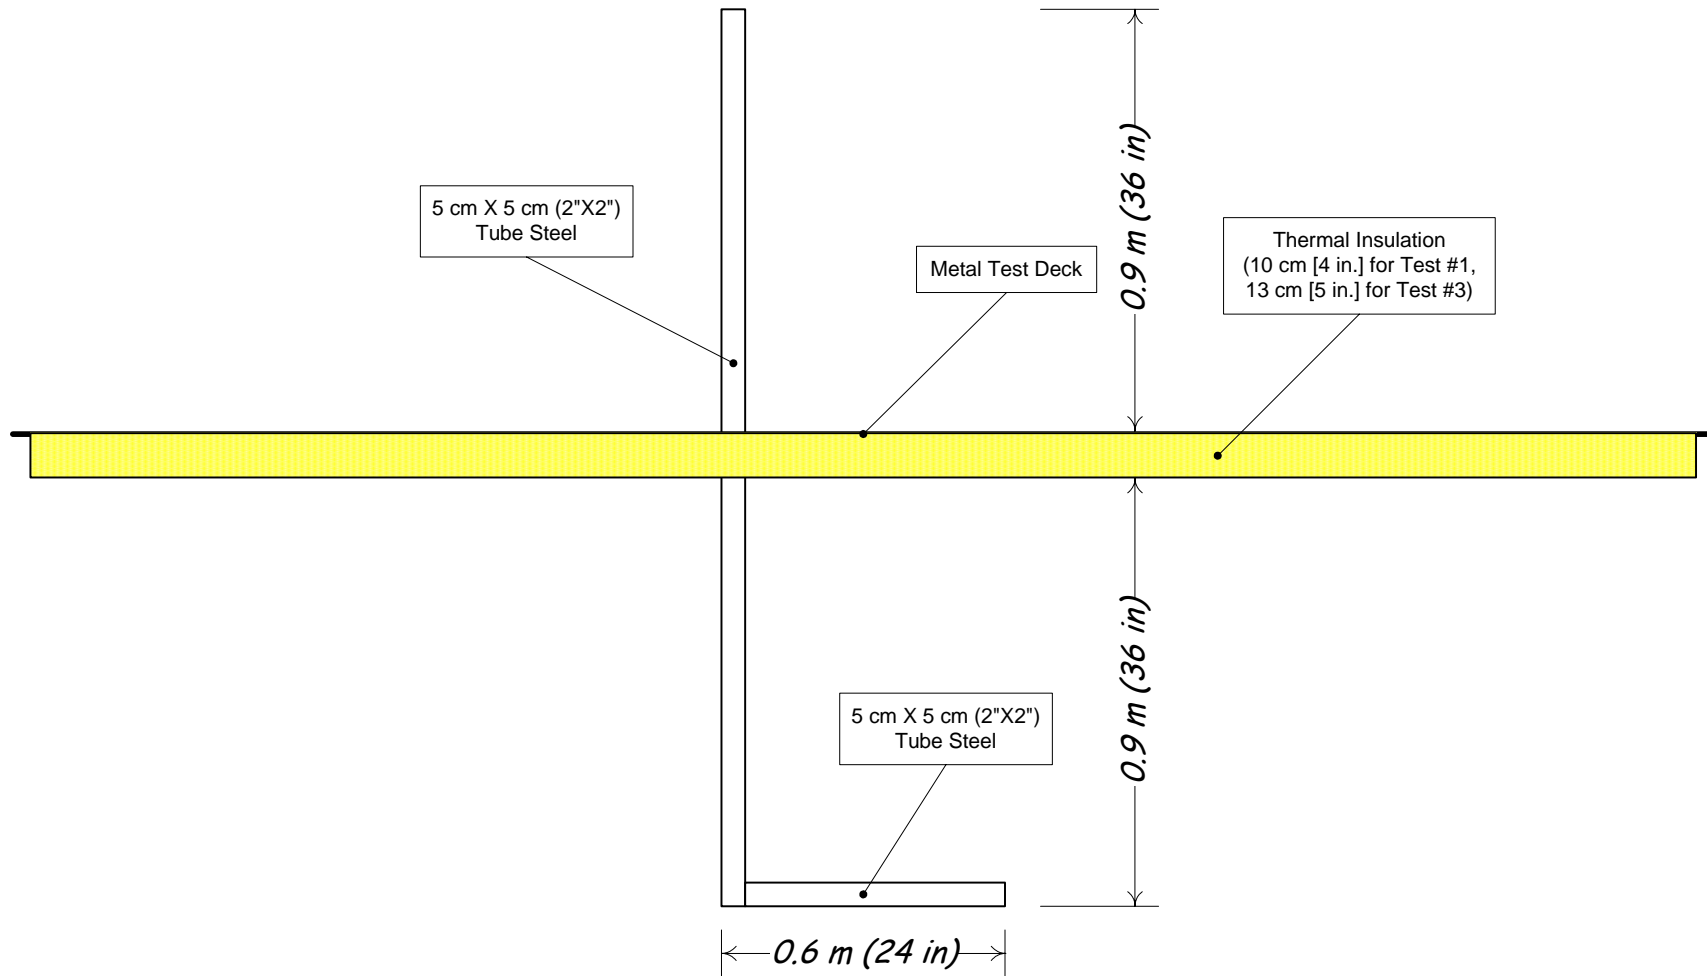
Tube steel support structure test specimens (side view with dimensions).
